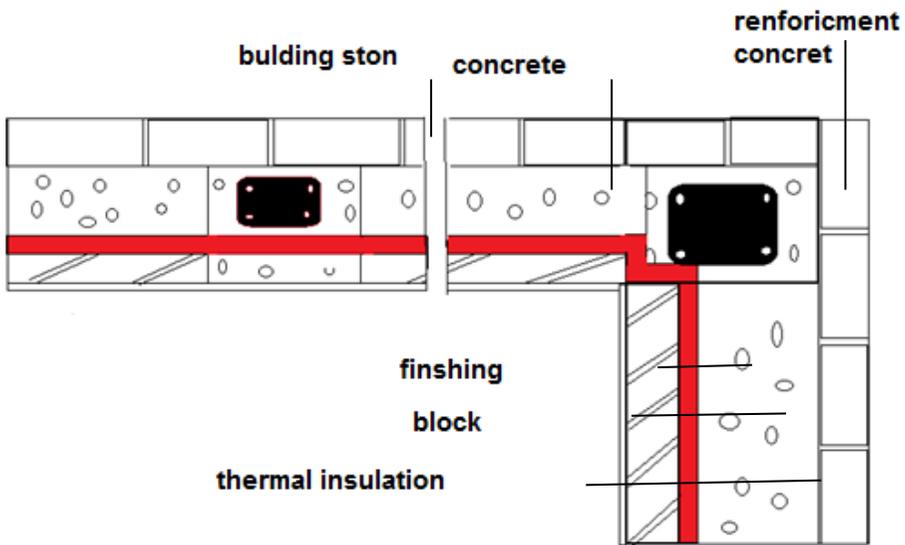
Implementation insulating at columns corners and armed columns (Alaaysh, 1990)
